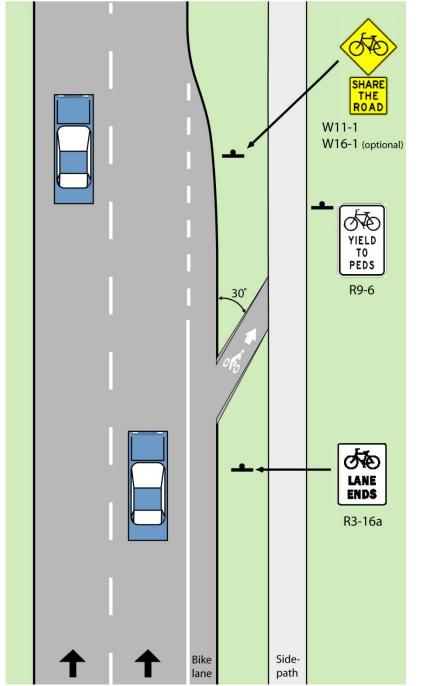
B. Bicycle Exit Ramp from Bike Lane to Sidewalk Bikeway Design Guideline
